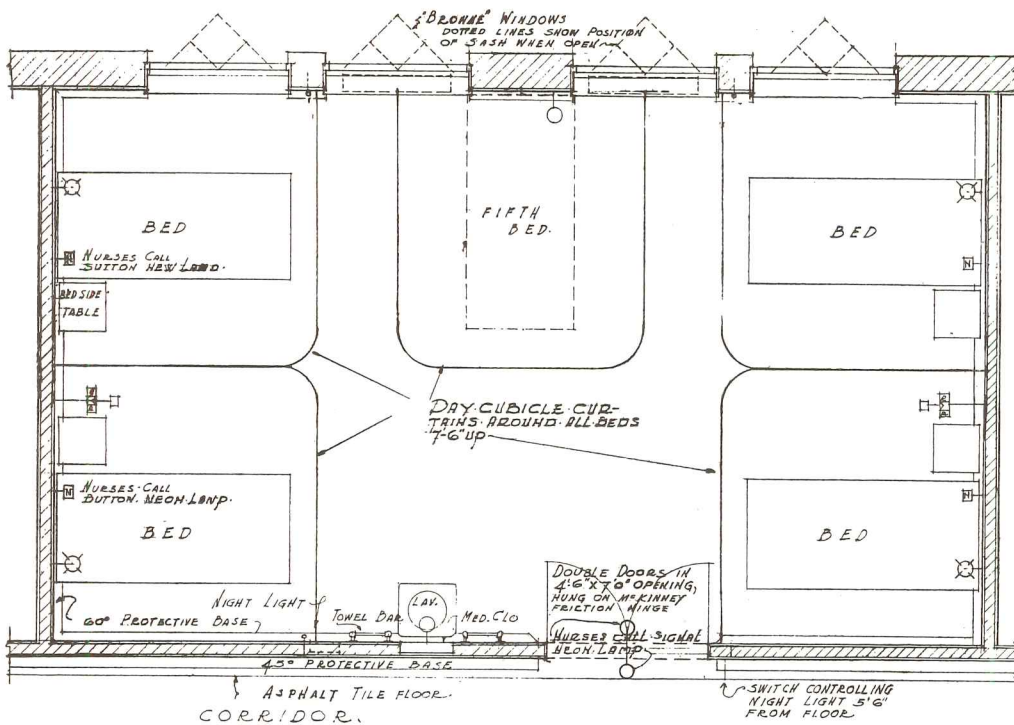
PLANS AND ELEVATION OF CONVERTIBLE ROOM
